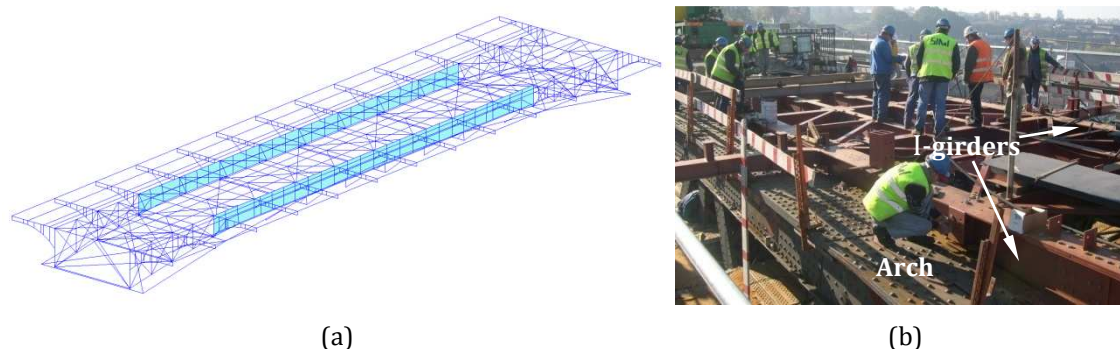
Modeling of the upper deck at the arch crown: (a) I-girders simulated by shell (web) and frame (flanges) elements; (b) installation of the new upper deck steel structure during the rehabilitation.
